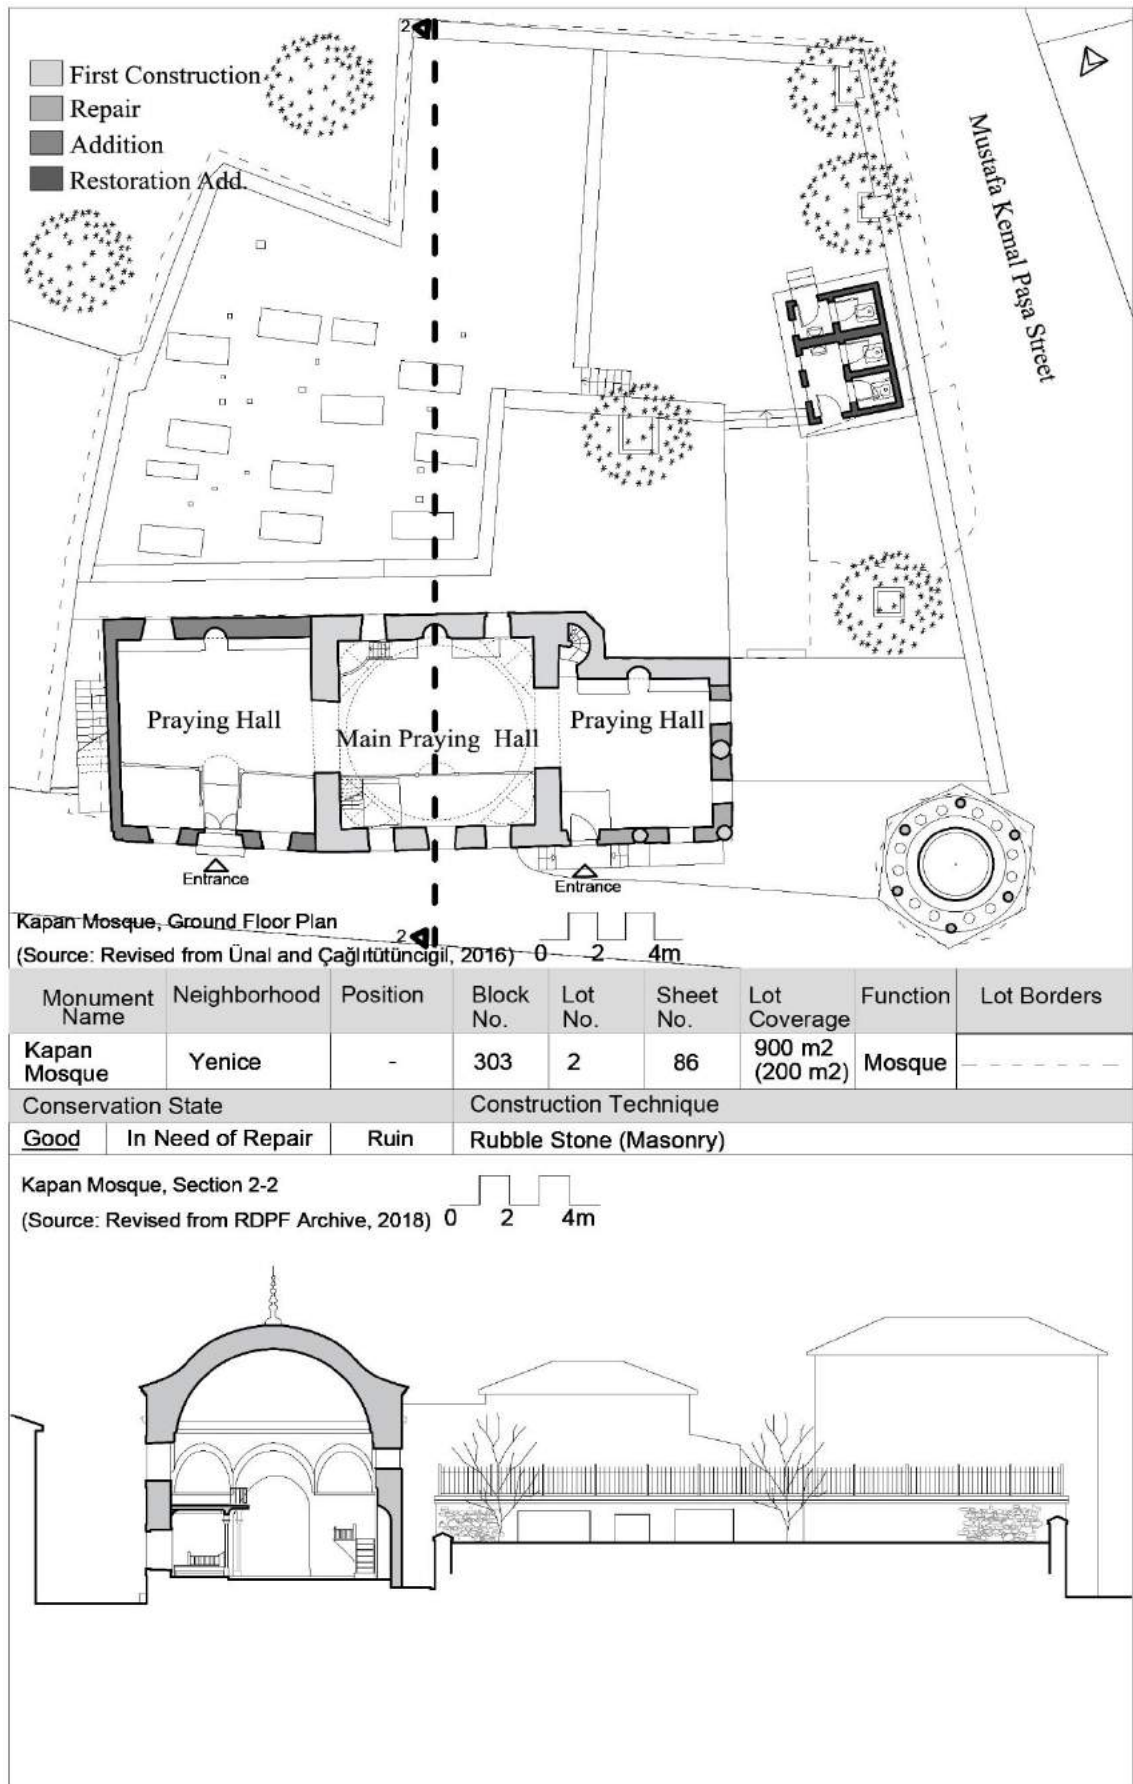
Ground floor plan and silhouette section, Kapan Mosque
